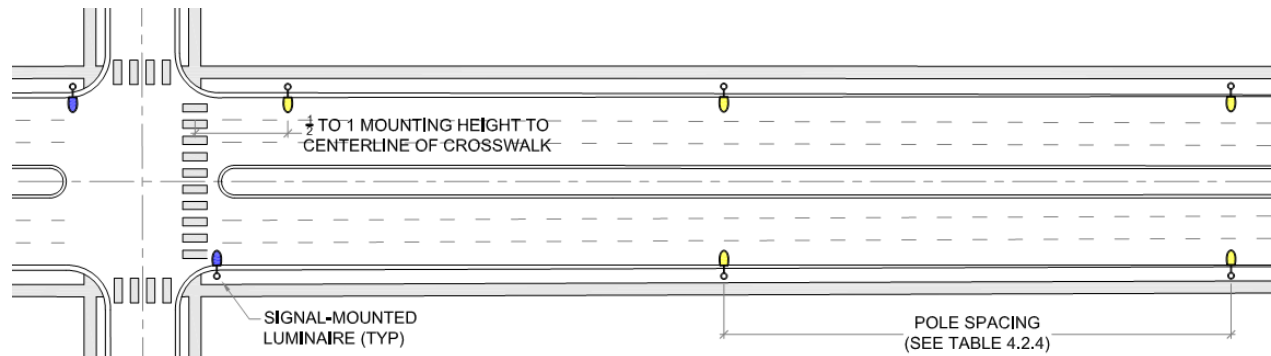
Typical Six Lane Arterial (non-median mounted) Street Cross Section
